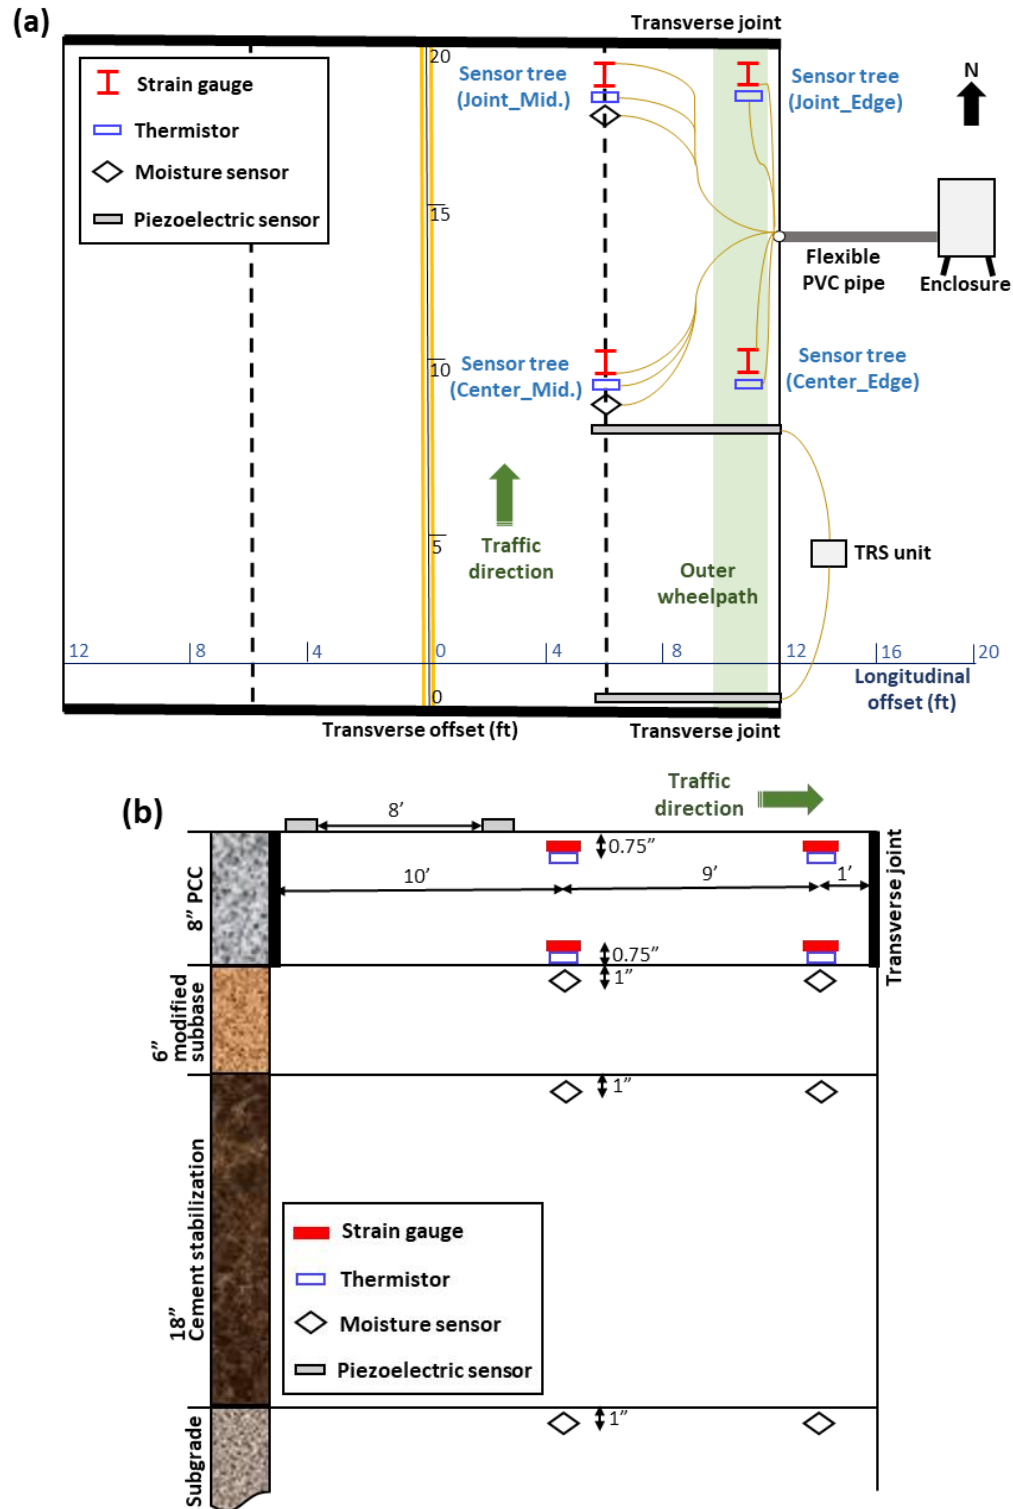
Sensor installation plan for JPCP section: (a) plane view and (b) cross-sectional view
